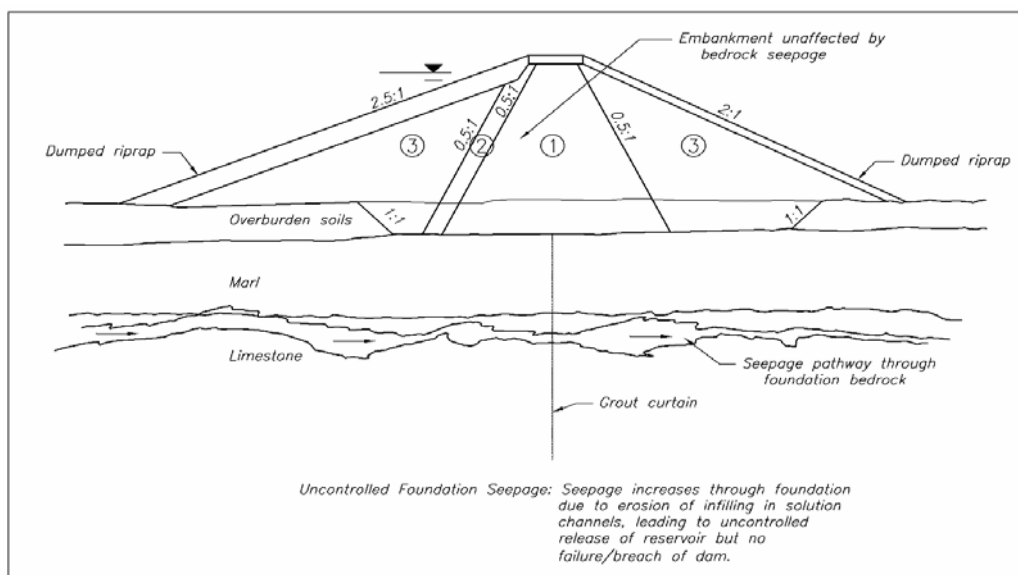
PFM4 - Uncontrolled Foundation Seepage Failure Mode
